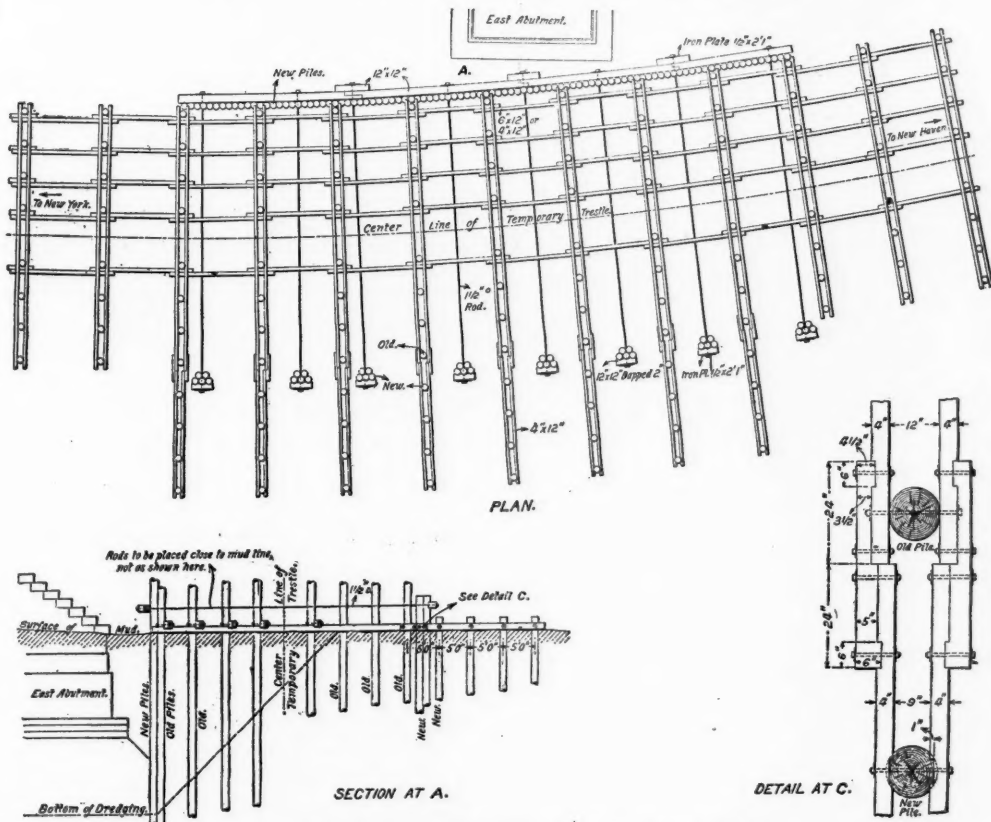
Re-Enforcement of Temporary Trestle—Norwalk Bridge.
